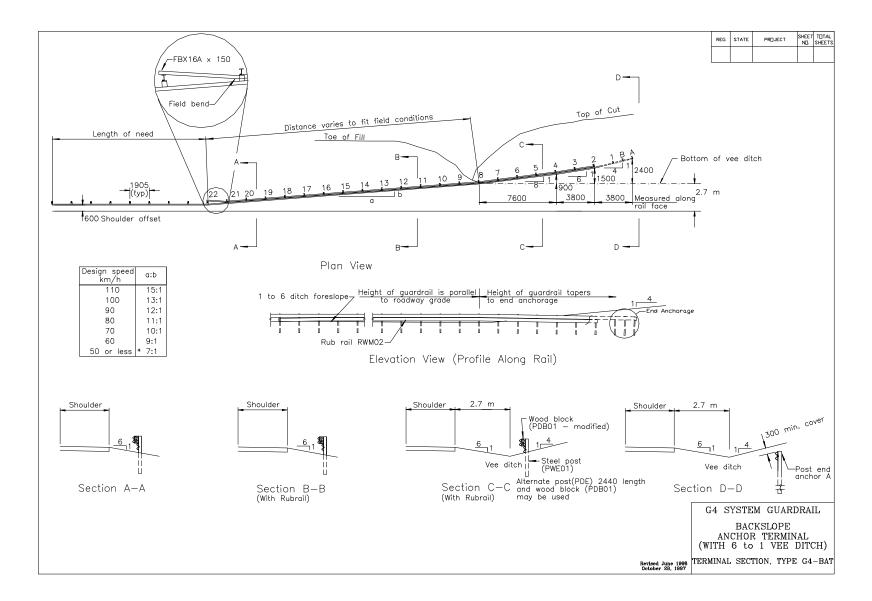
Details of the G4 W-beam guardrail buried-in-backslope terminal installation for test 404211-1.
